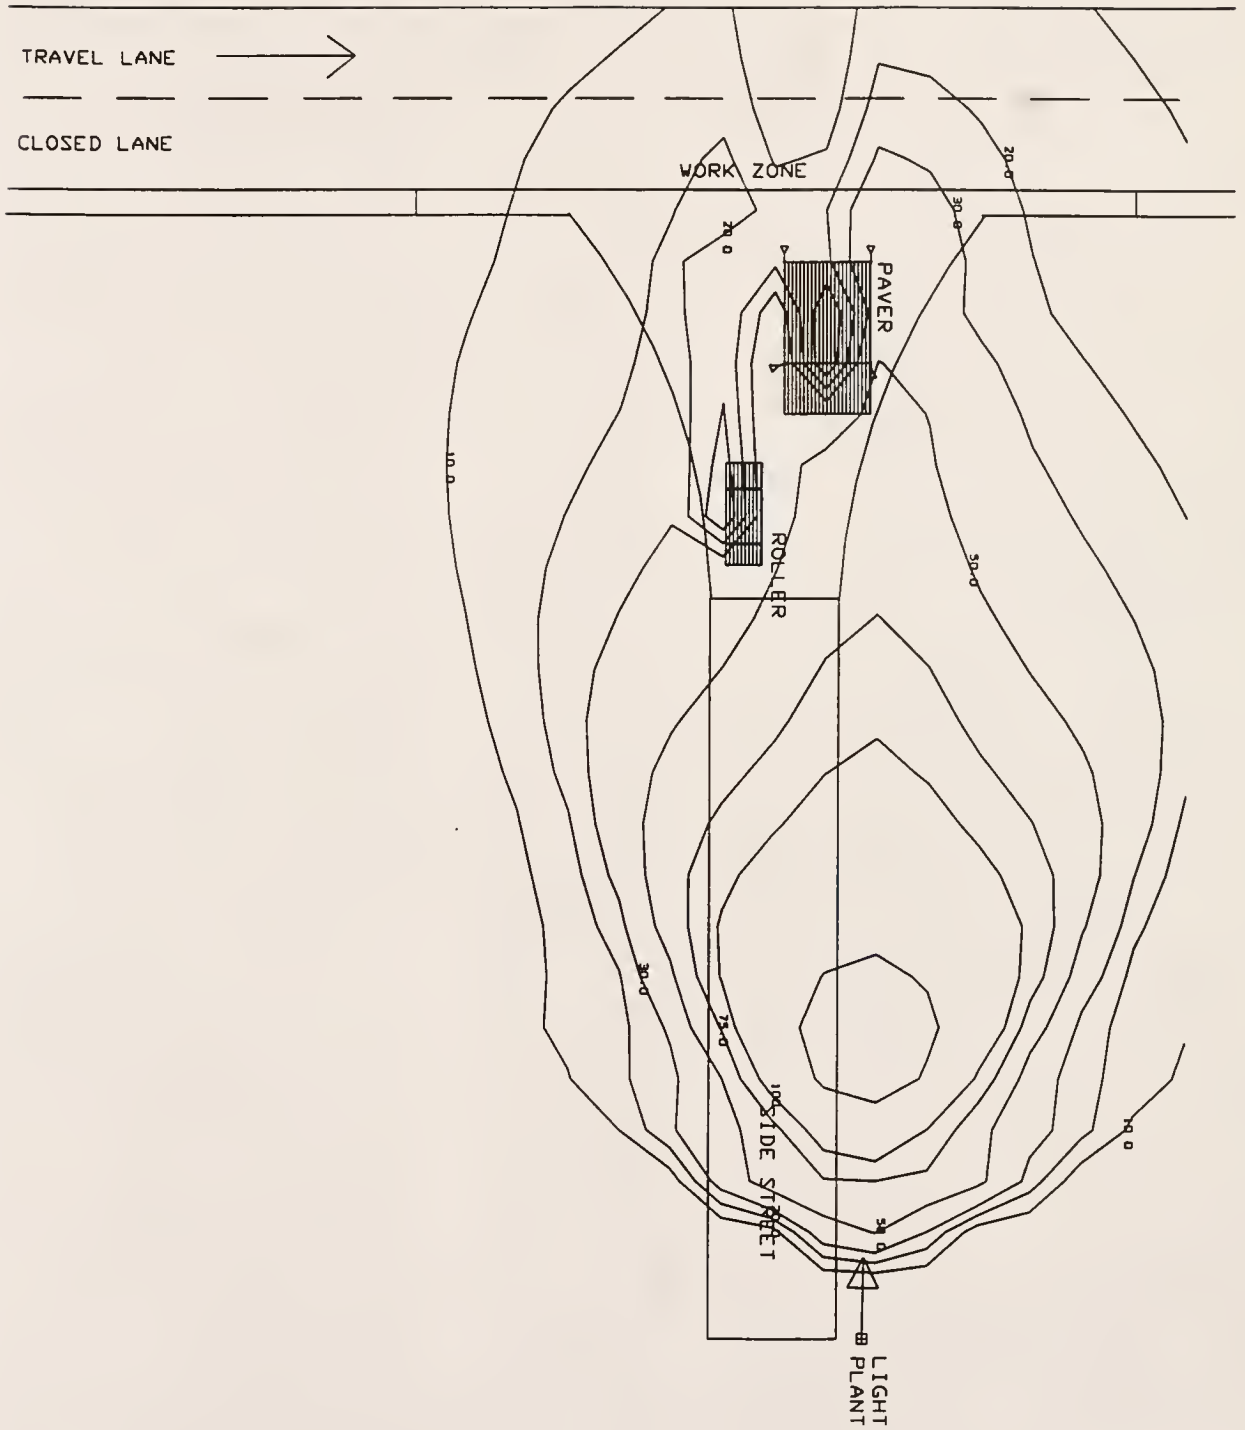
Plan Layout of Workzone (Case Study 2: Repaving Intersection)
